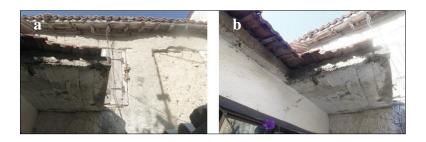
Bahise Sakallıoğlu House e., f. View of the upper floor wall containing "haney" from the courtyard and roof details (*haney: parts of the house between the floors, hall) (S.Sevimbige archieve, 2017)
